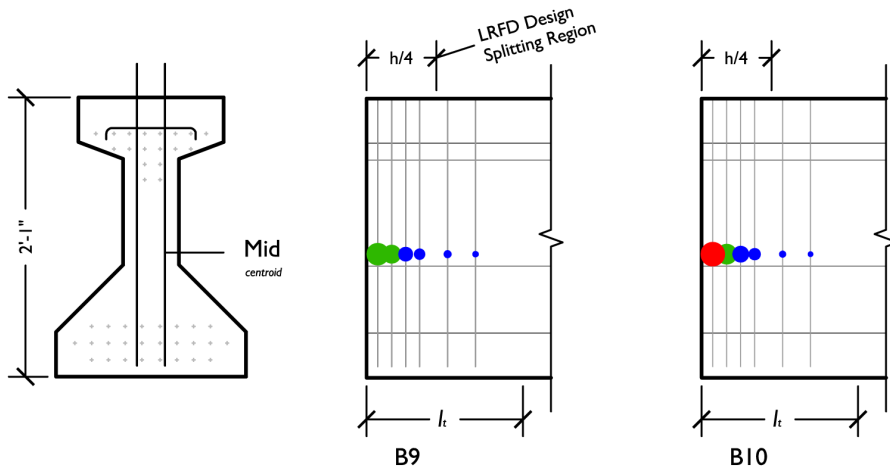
Shallow Nebraska bulb tees (NU girders), proposed reinforcing details
